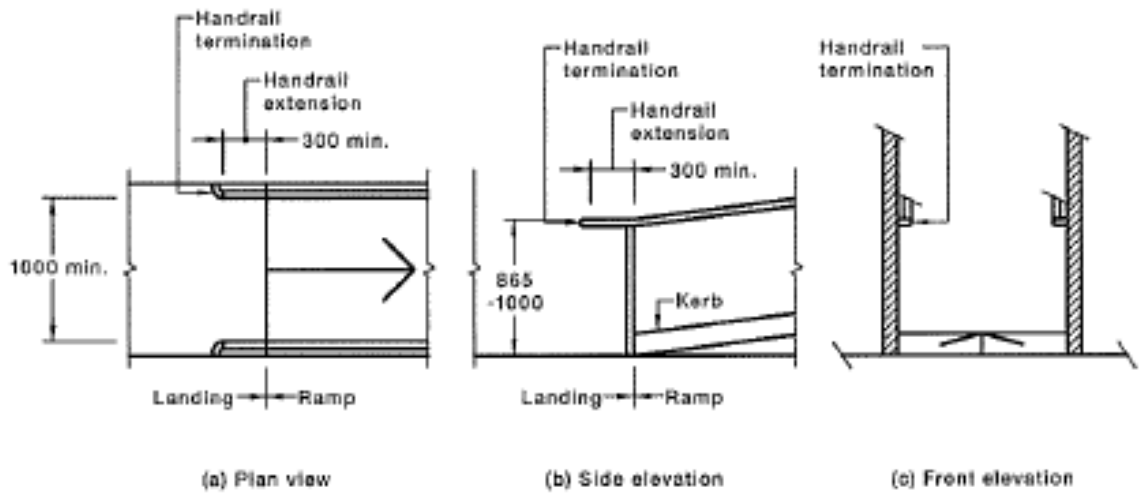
(A) RAMP HANDRAILS—EXAMPLES OF HANDRAIL TERMINATIONS
